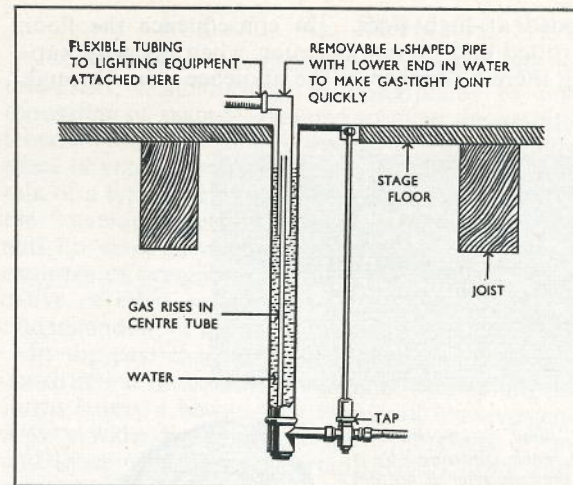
Section through a water joint; used to make speedy gas-tight connections for portable equipment.
